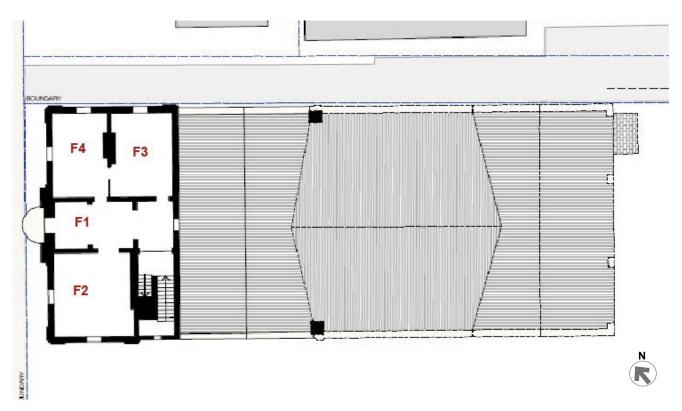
(Above) First Floor Level Existing Plan Source: Brewster Hjorth Architects
